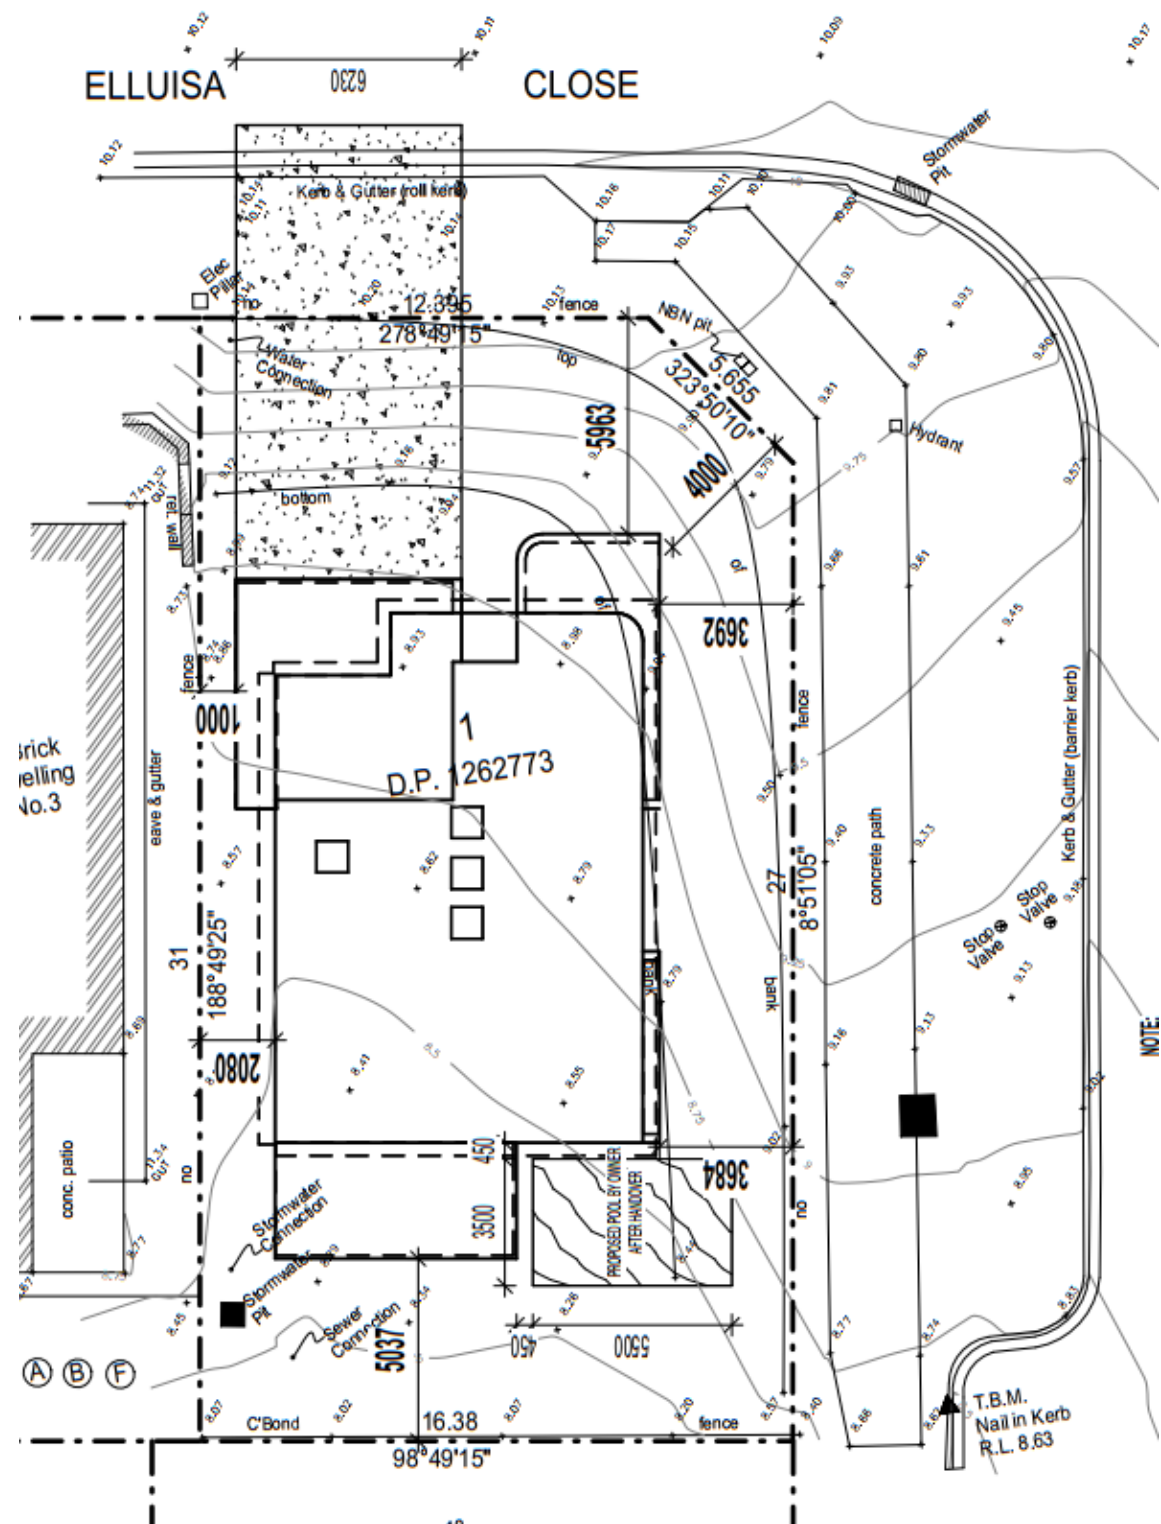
Site Plan Extract – Source: GJ Gardner. Not to Scale.
